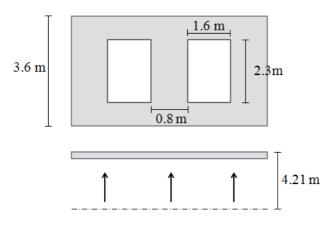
Dimensions of wall elements used in the concept and the influence width from loads applied on the floor.
